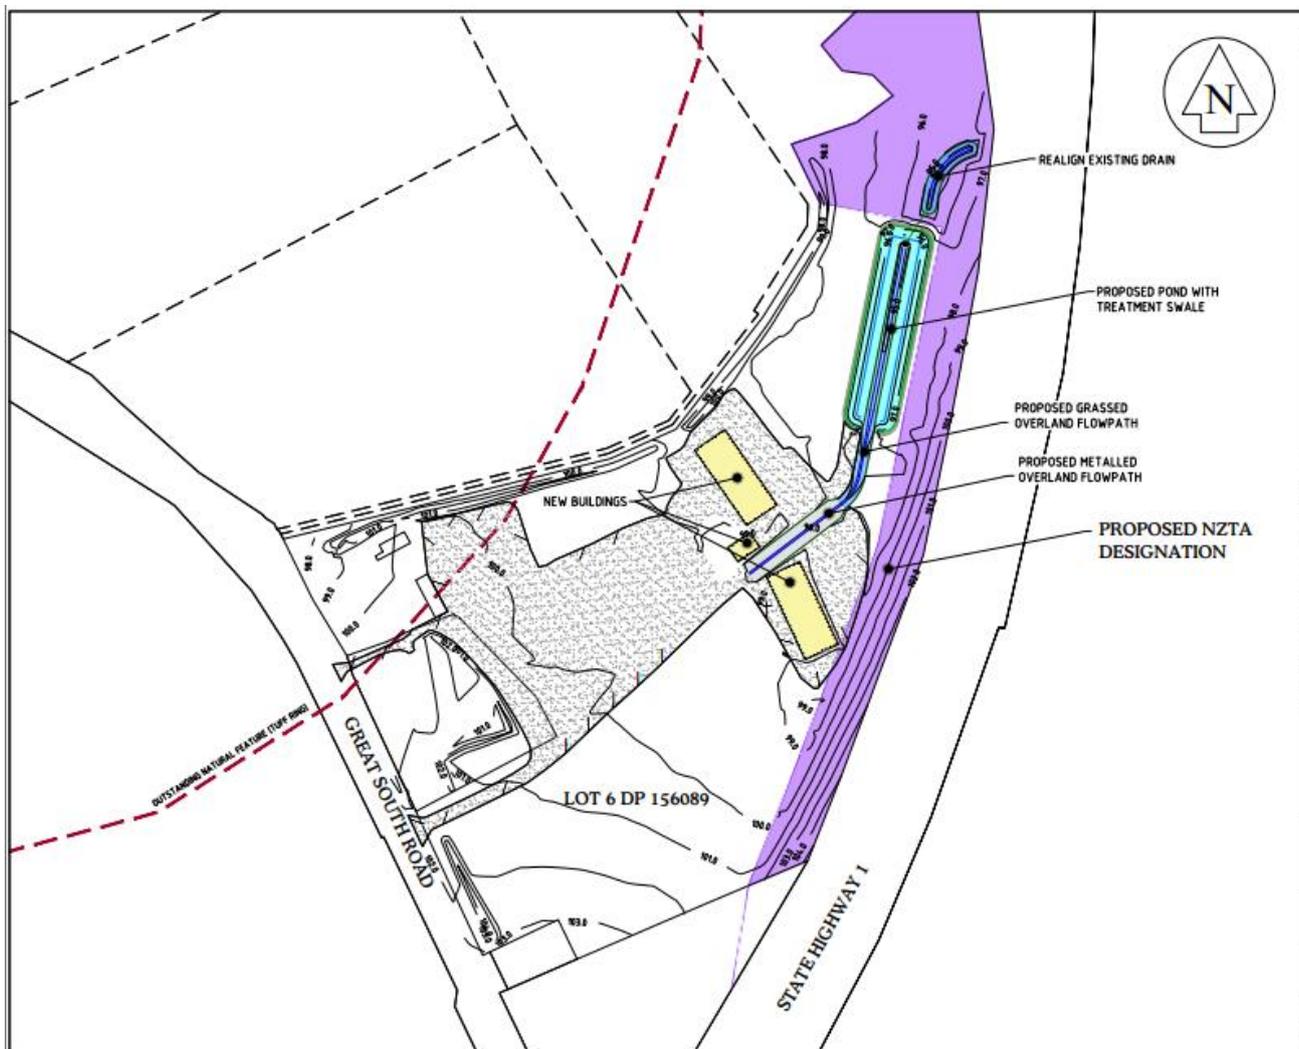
Overview of stormwater mitigation – sheet 6 of Engineering Design Plans (Appendix 4).
